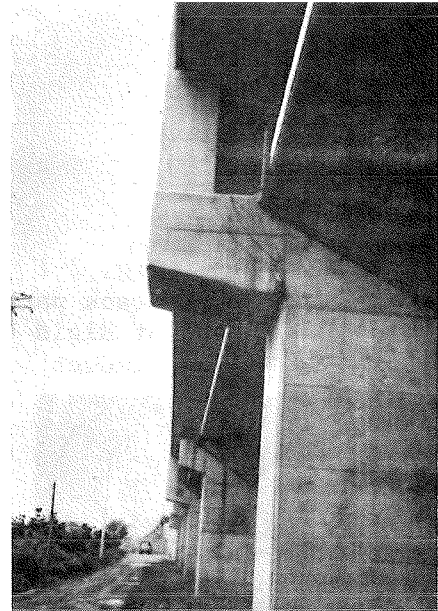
Girder-Type Viaduct and Diagonal Cracks of Short Gasset
